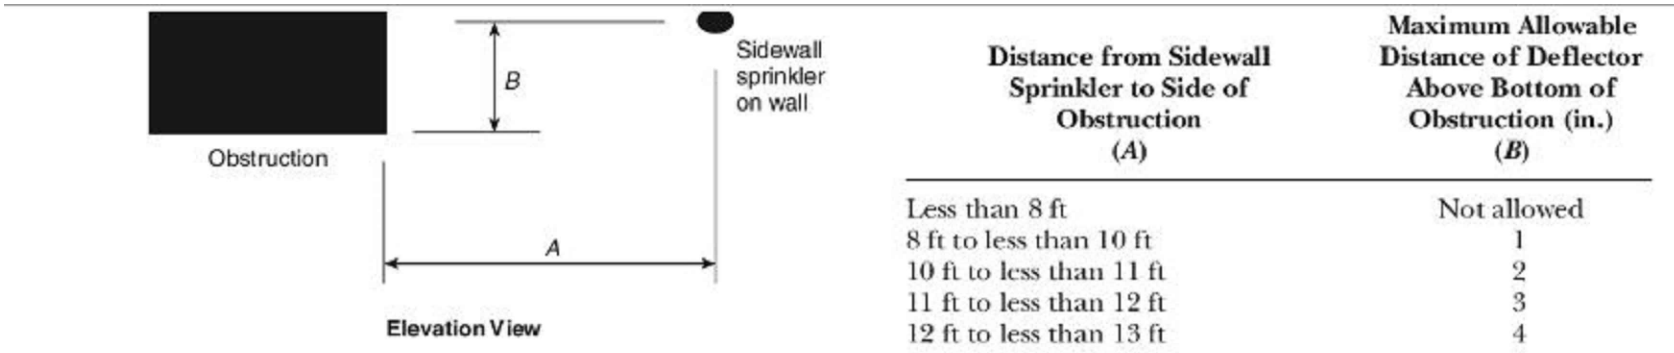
(b) Positioning of Sprinkler to Avoid Obstruction Along Wall (Residential Sidewall Sprinklers).
